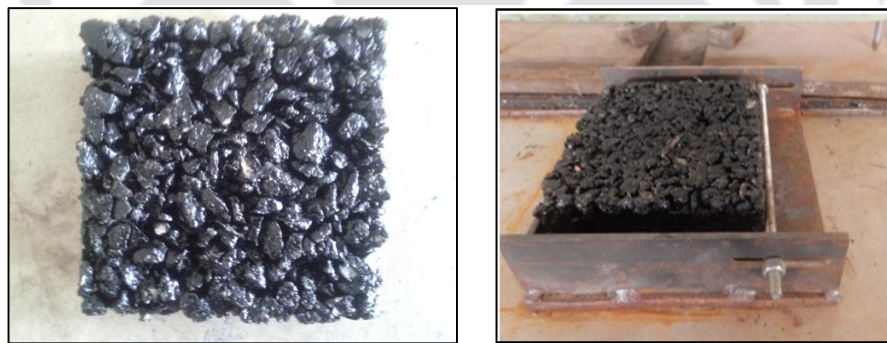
(a) OGFC slab specimen (b) finished slab specimen attached with test assembly
